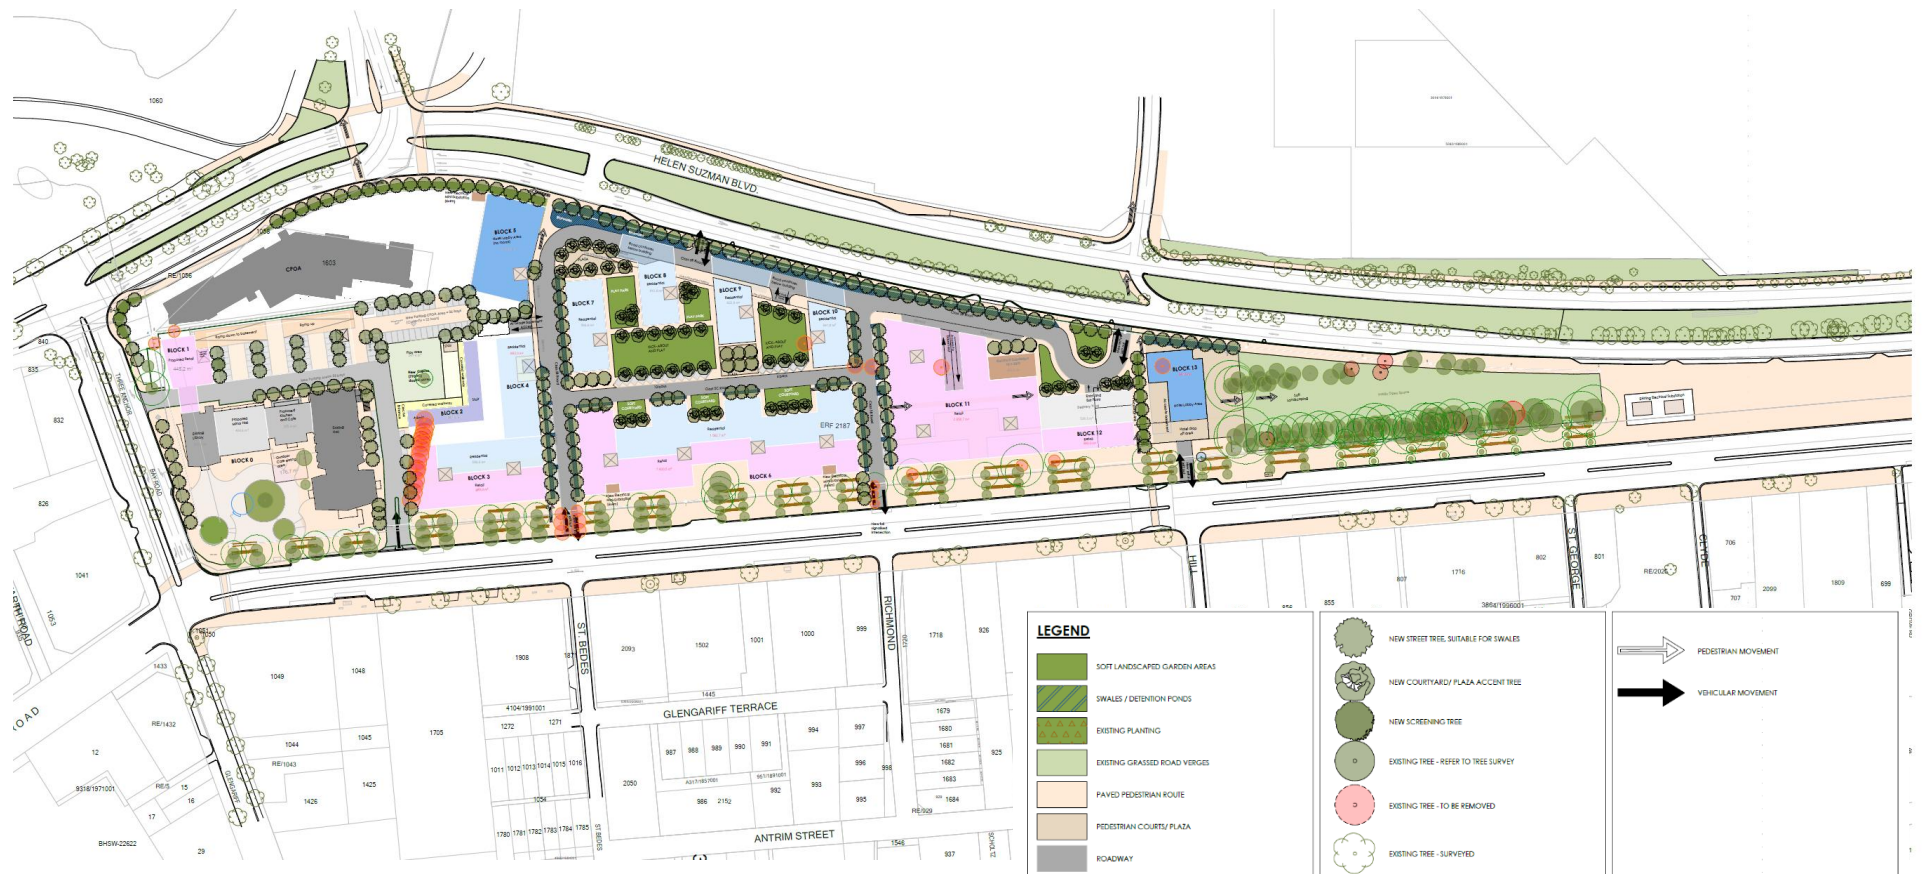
Proposed landscaping plan for the site (Source: ACG Architects, 2026)
